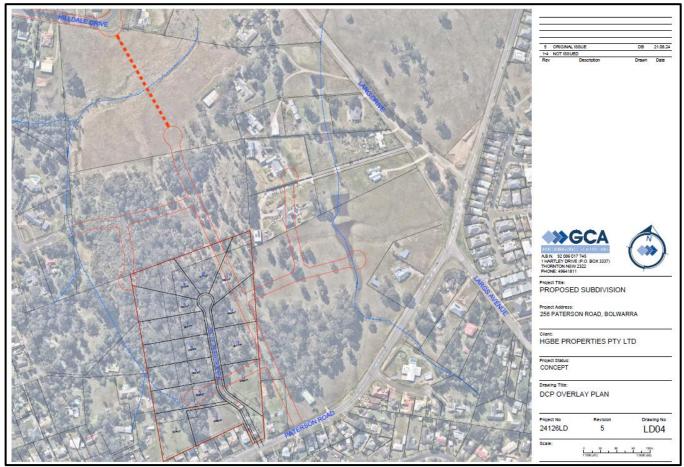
Proposed subdivision layout with locality plan (Part D.3 – Locality Plans (Bolwarra Heights)) overlaid
